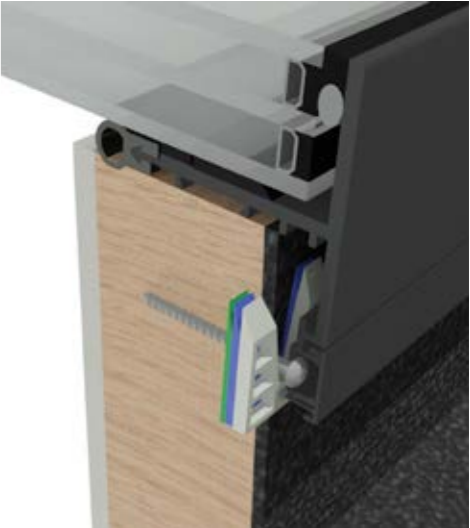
Drawing References: 402ASS051 Flushglaze® Kerb Detail
